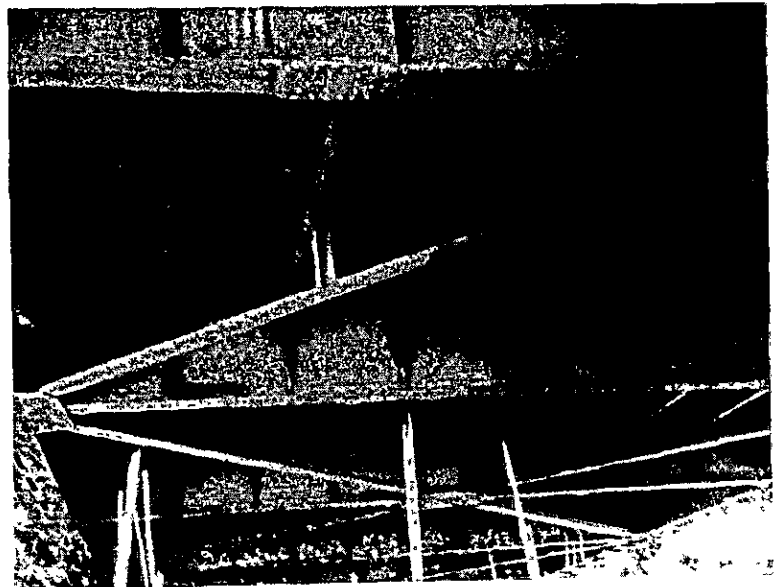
Visual Investigation of Floor Slab Cracks and Rustings of Stringers, Cross Beams
